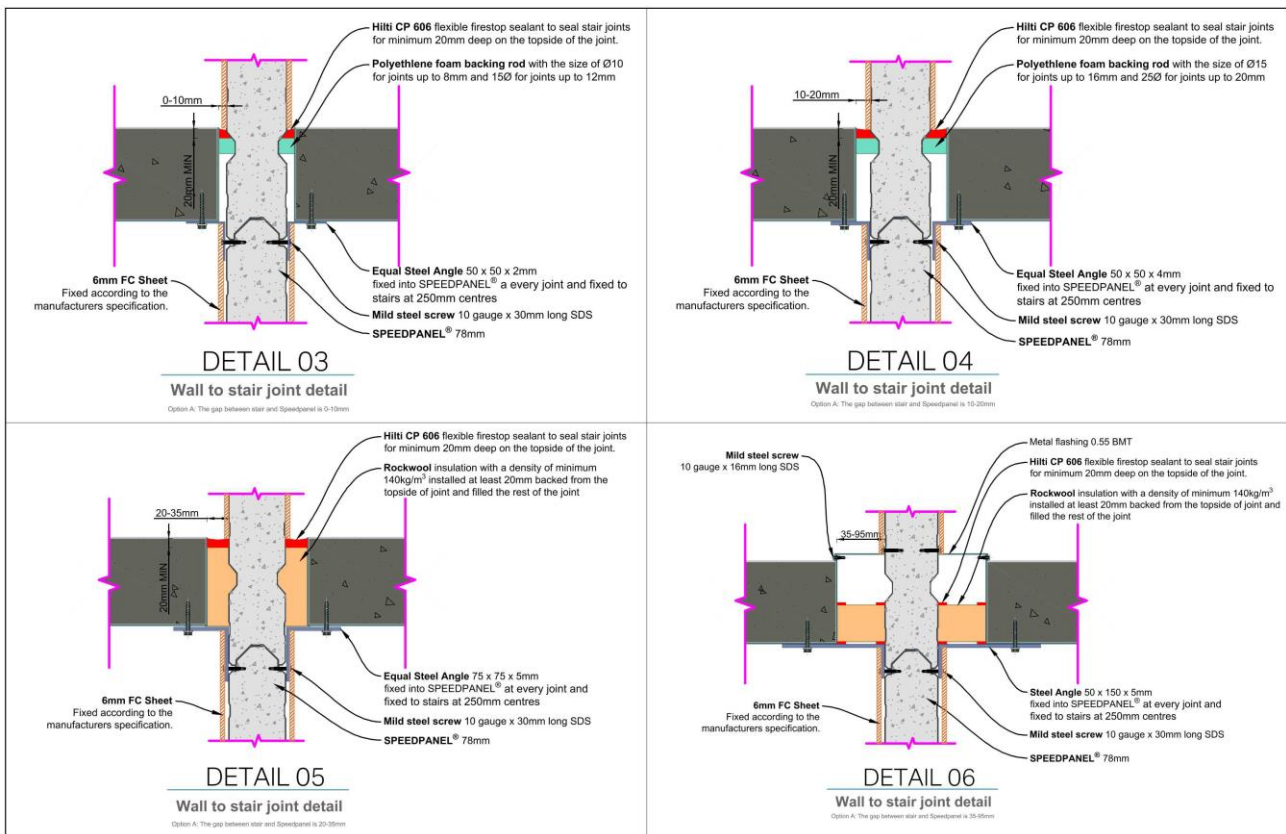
Wall to Stair joint detail variants (as referenced in Figure 27 with Fibre Cement cladding)
